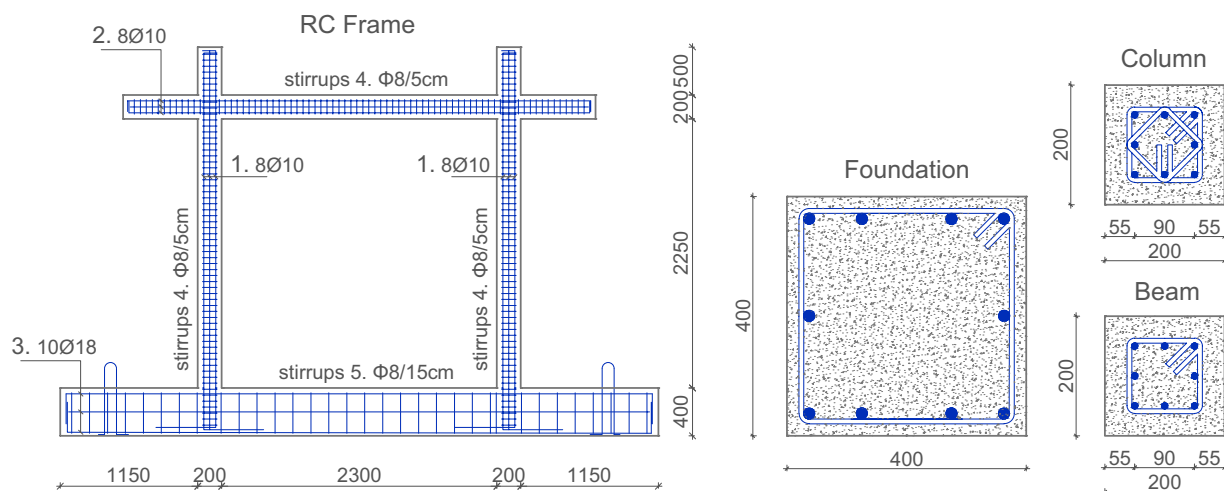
Geometry and reinforcement details of tested RC frame. (Dimensions are in mm).
